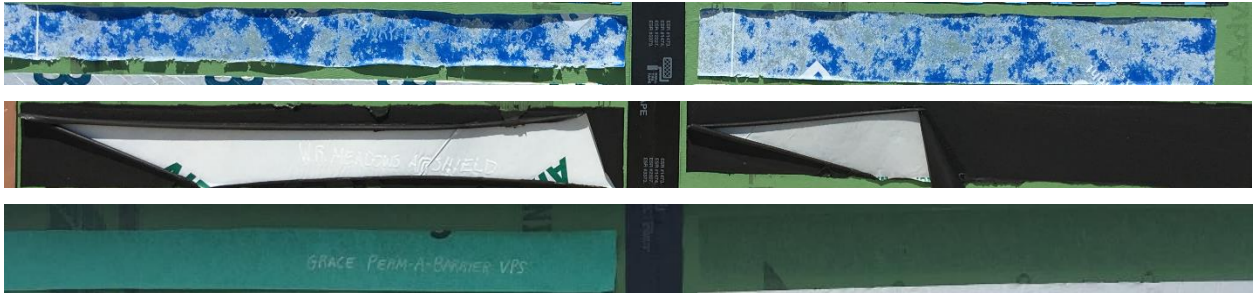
Consistent failures occurred on two sets of specimens that were installed six months apart
